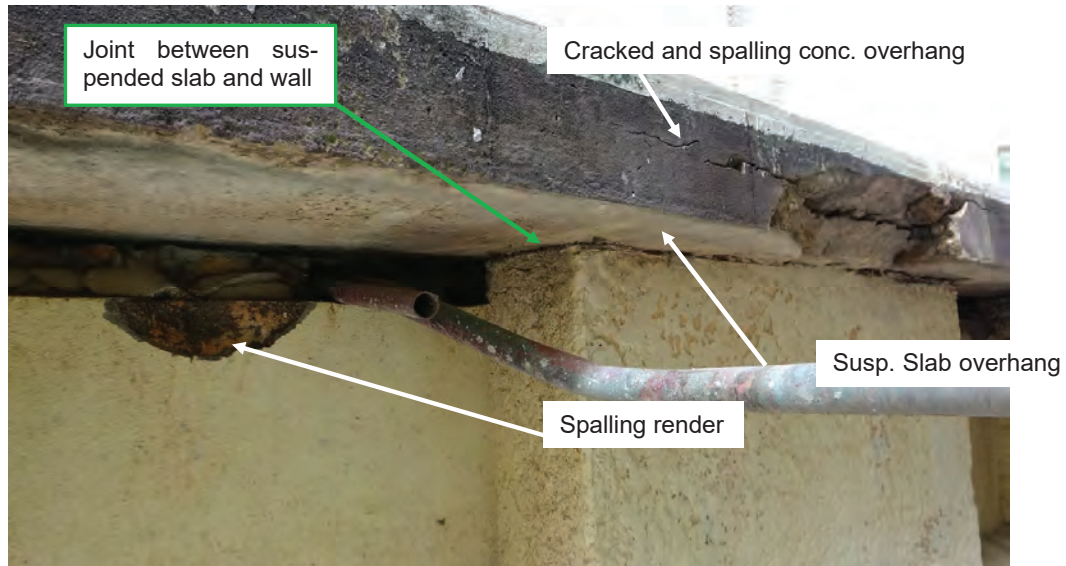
Rear retaining wall at approx. 3-D. Note gaps above window infills, spalling of concrete overhang, joint between suspended slab and wall.
